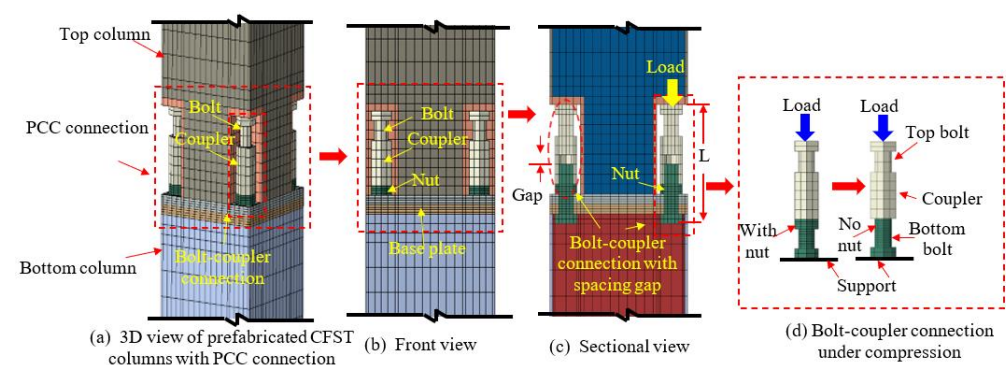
Bolt-coupler connections under compression in prefabricated CFST column.
